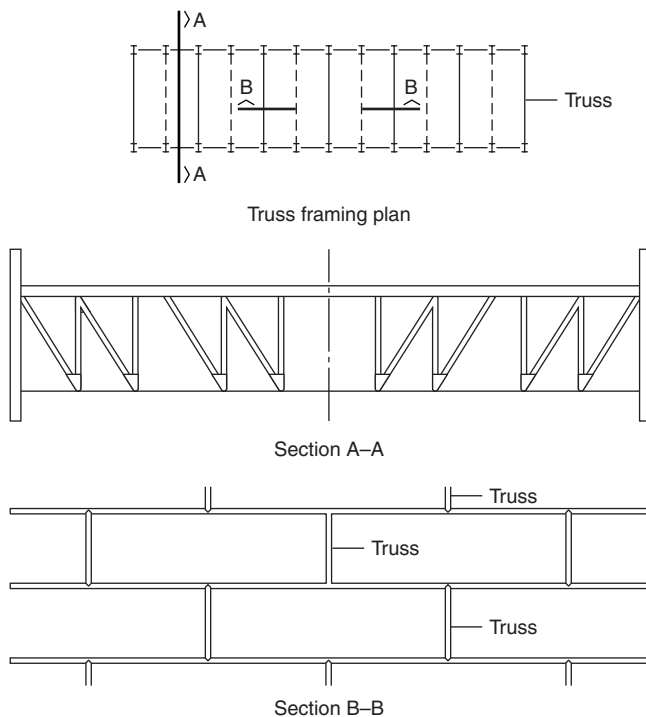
A typical truss and positionings in a staggered truss system.³³
